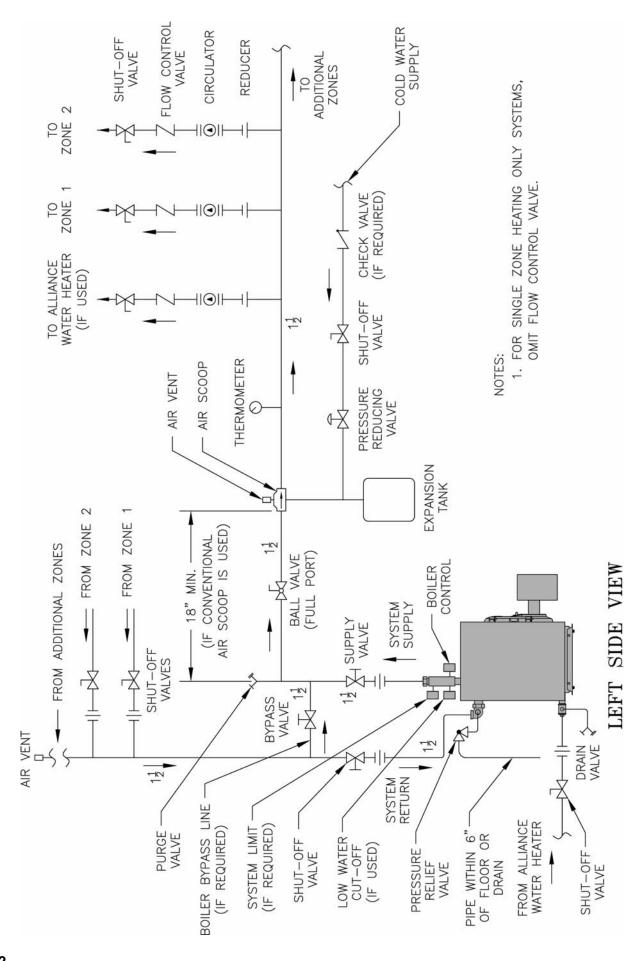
A: Water Boiler Piping for Circulator Zoned Heating System - Supply Side Circulator
